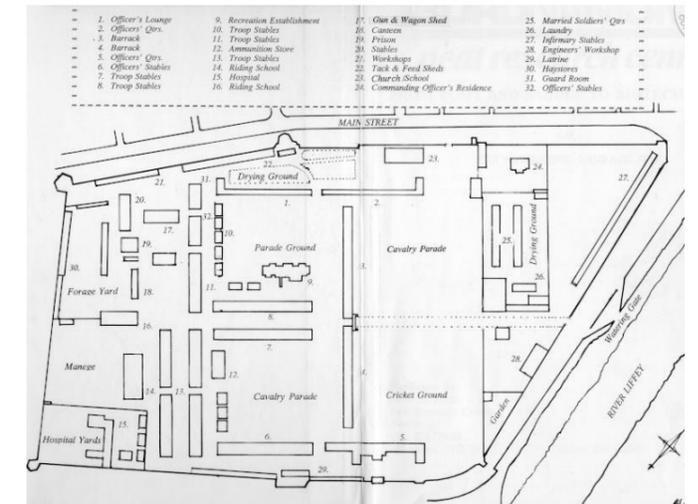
Plan of Newbridge Calvary Barracks dating to 1901.
